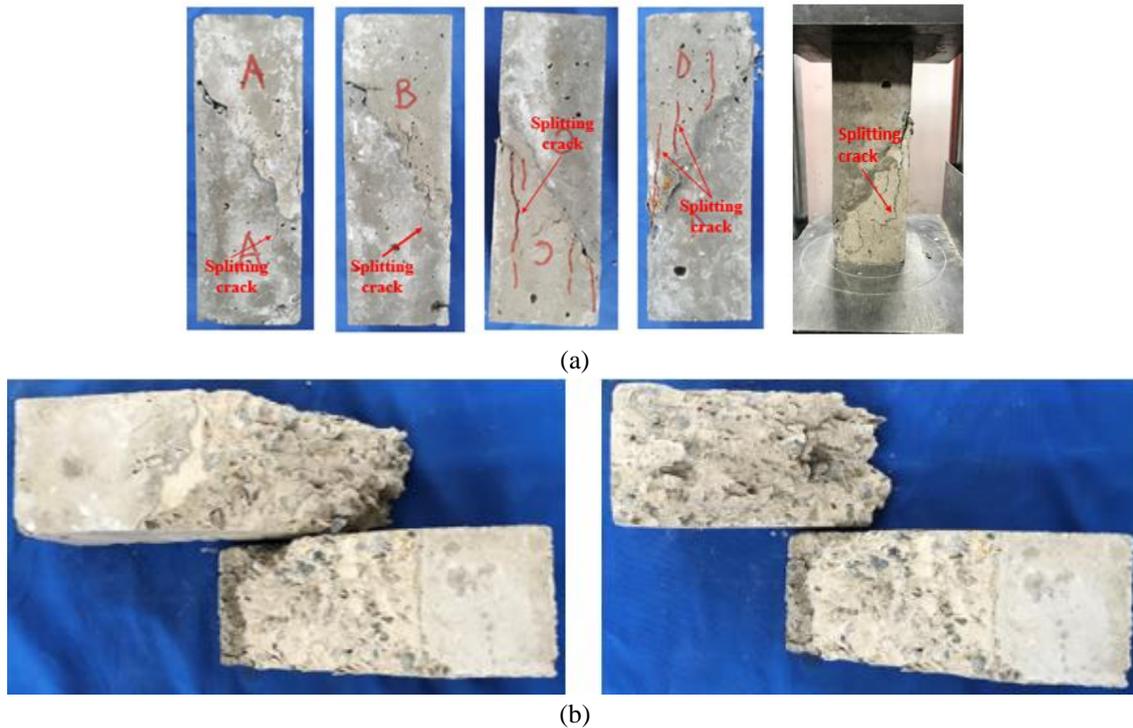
Failure modes of slant shear specimen (a) Splitting cracks in the old concrete (b) Concrete failure
